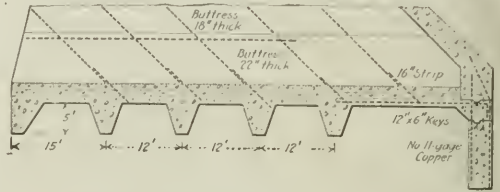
SECTIONAL ELEVATION OF BUTRESS FOOTING ON CLAY
